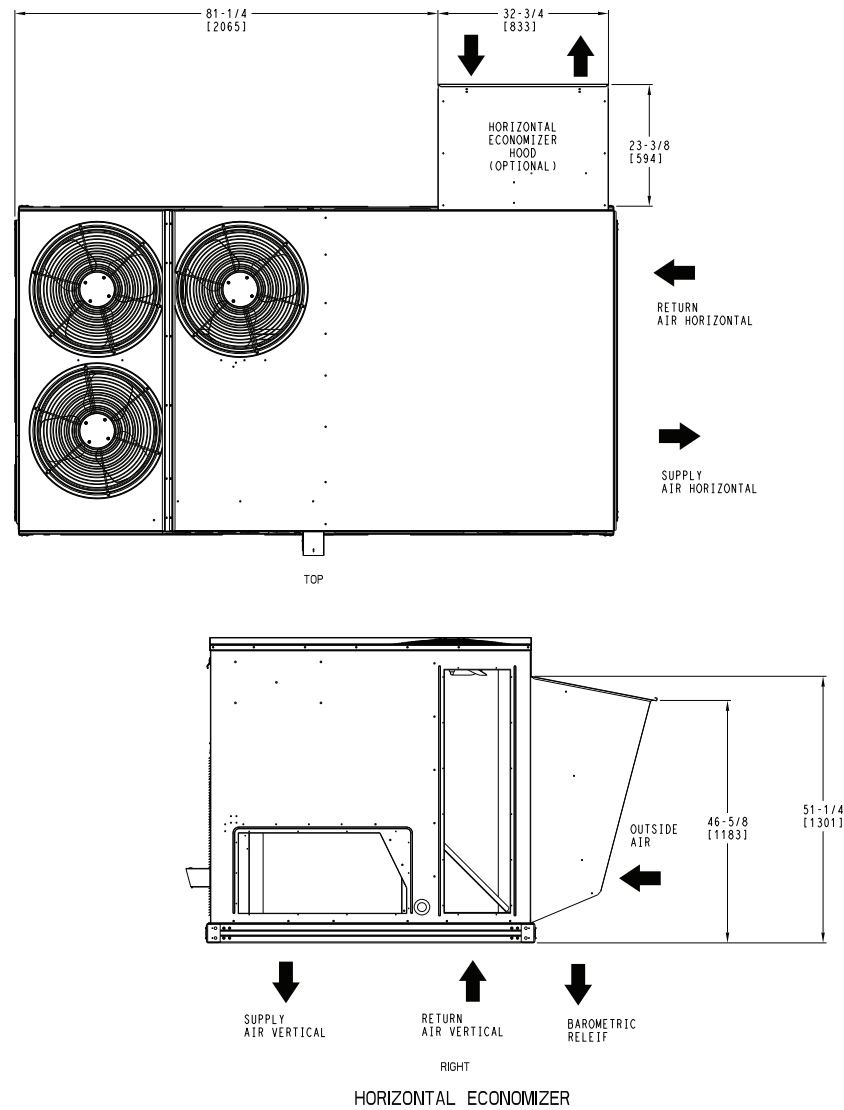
Unit Dimensional Drawing, 48WE*H12, Single-Zone Electrical Cooling with Gas Heat
